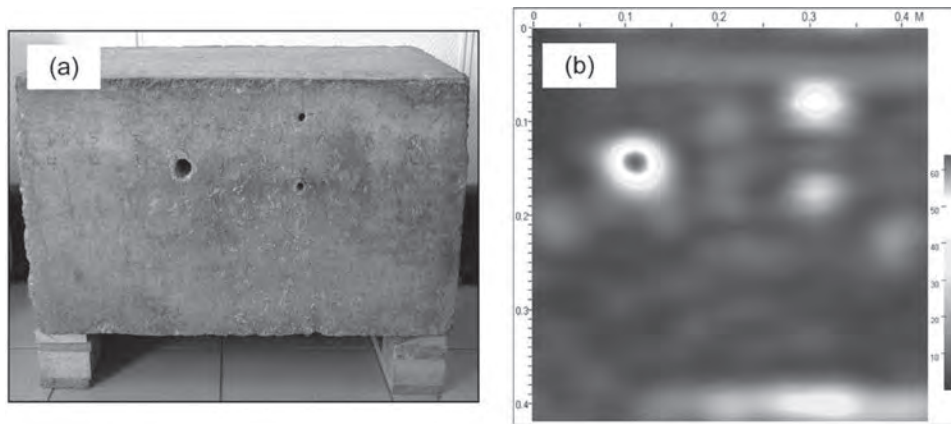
(a) Concrete block with three holes; (b) elevation view based of SAFT reconstruction using multiple pitch-catch measurements (figure courtesy of Germann Instruments).
